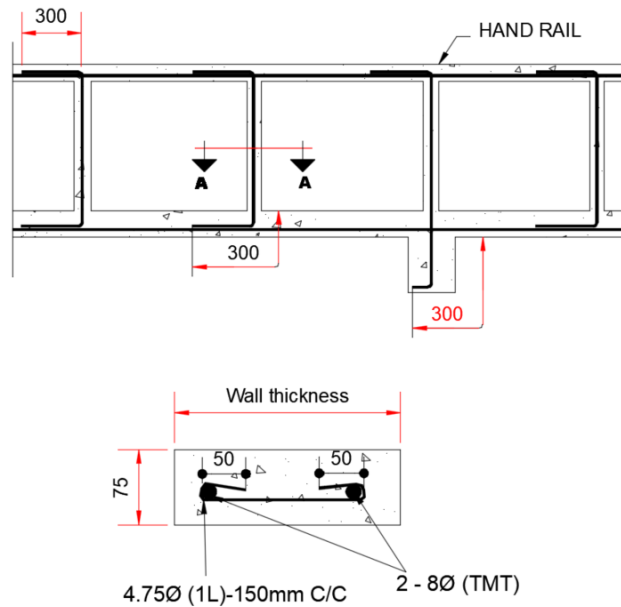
REINFORCING DETAIL OF PARAPETS
